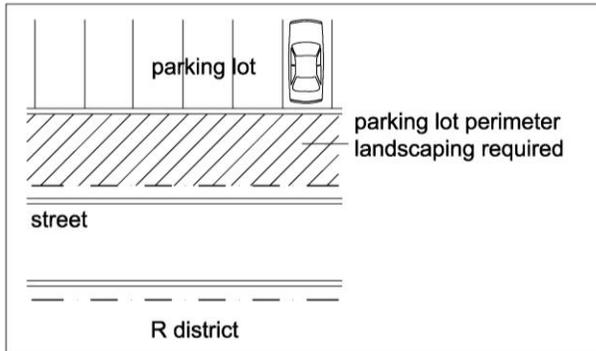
Street Yard Perimeter Landscaping Opposite R Zoning
